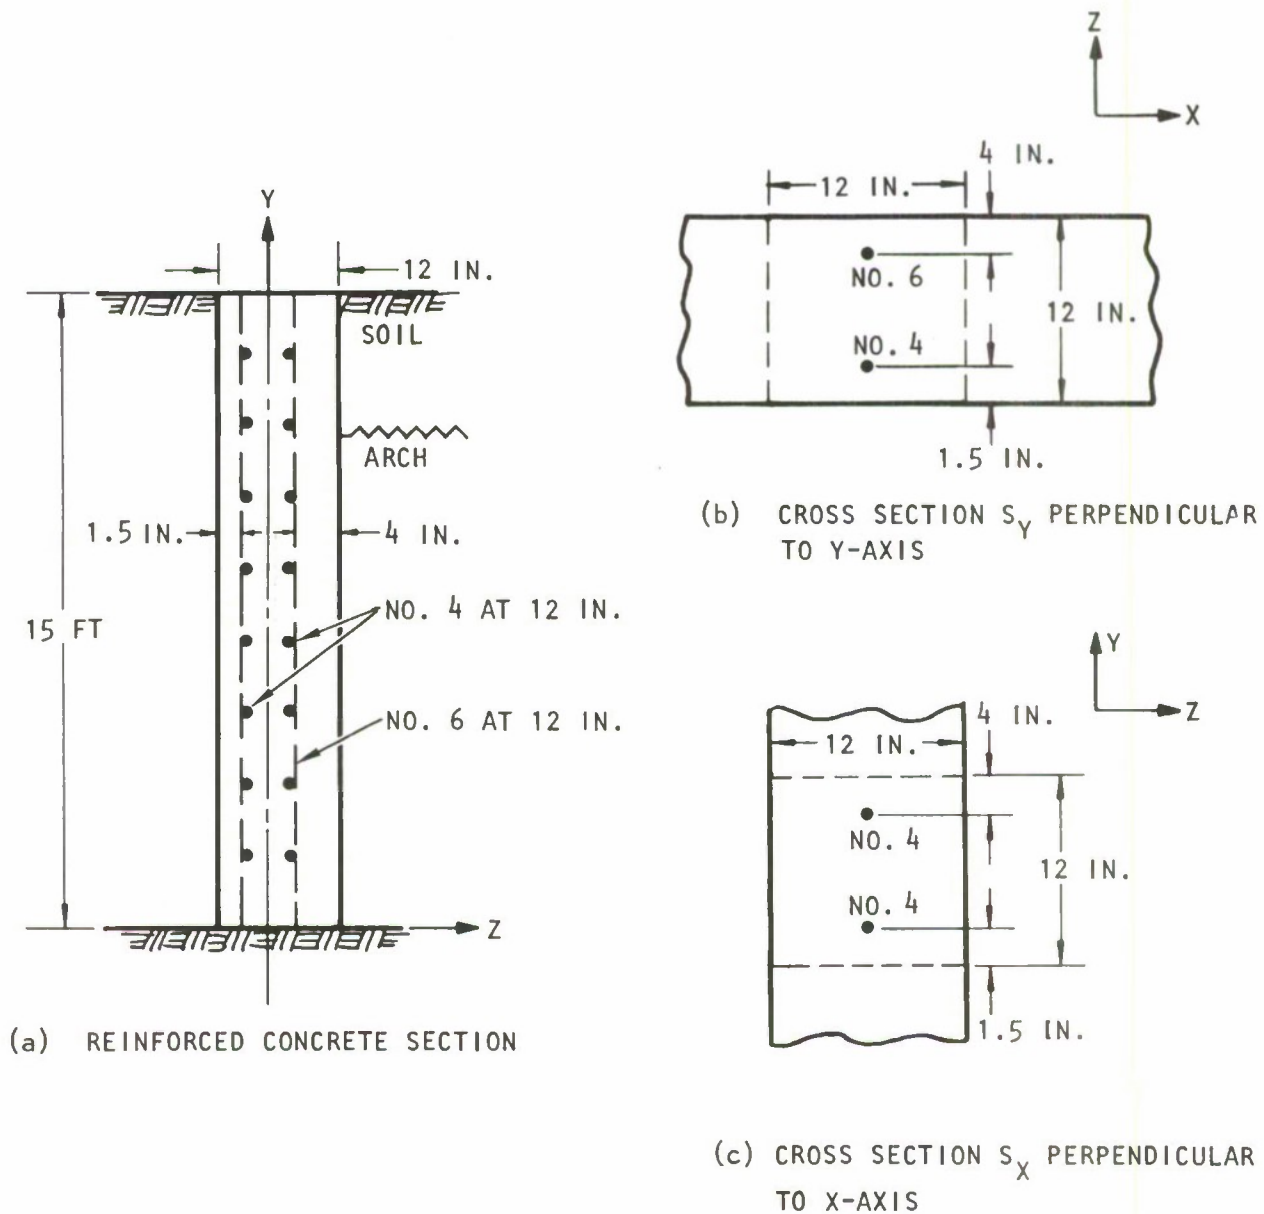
DETAILS OF HEADWALL CONSTRUCTION
